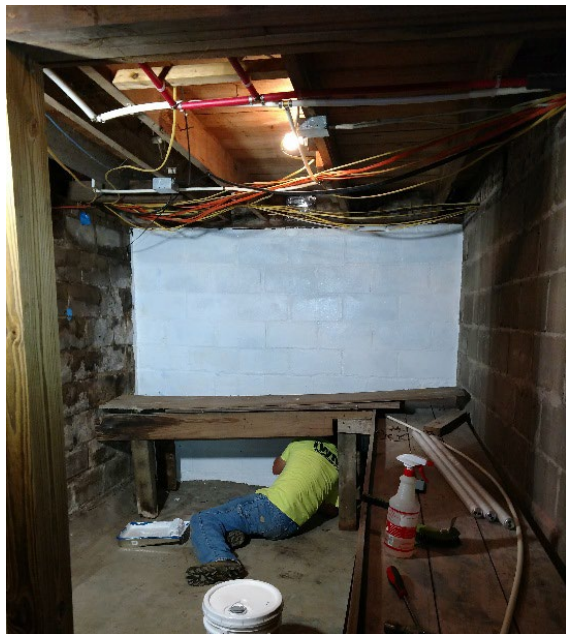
Each exterior basement wall was rigorously scrapped and cleaned. Each wall had three (3) coats of Ames Block and Wall sealer applied.
